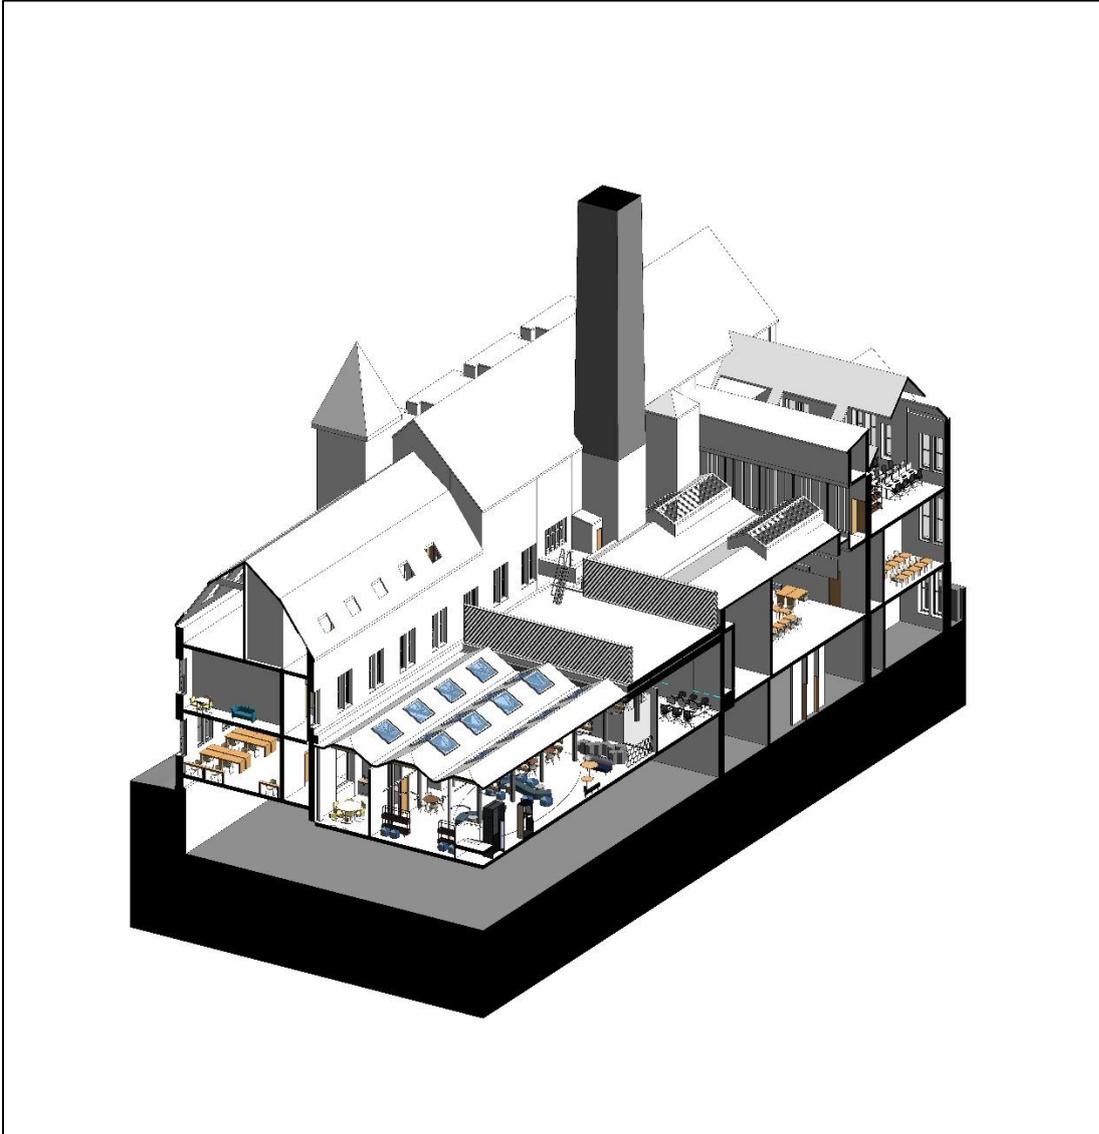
Proposed plant deck axonometric view (gssarchitecture)
